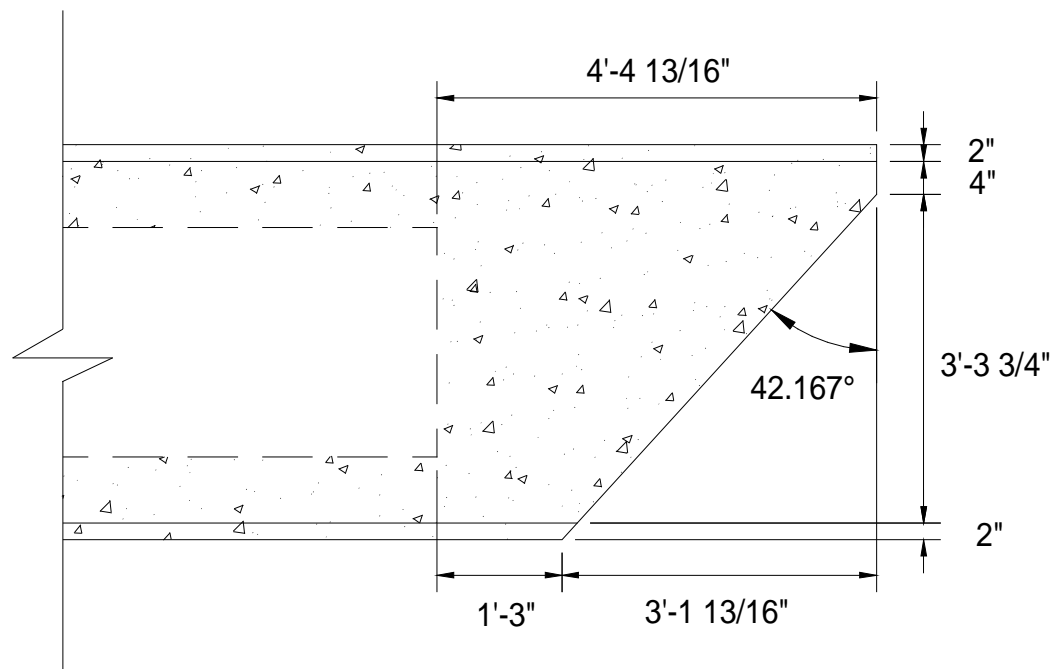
Nominal Plan Dimensions of End Diaphragm
